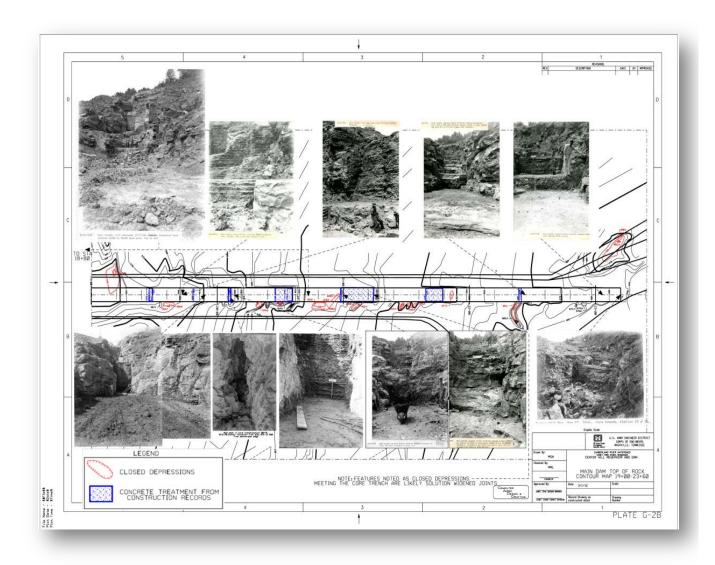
Example Plan View of a section of the Center Hill Dam Core Trench showing top of rock contours, areas of dental concrete treatment and construction photographs
